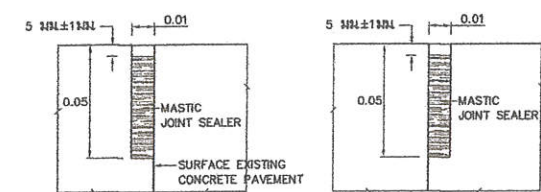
DETAIL OF SAWED JOINT FOR TRANSVERSE JOINT
